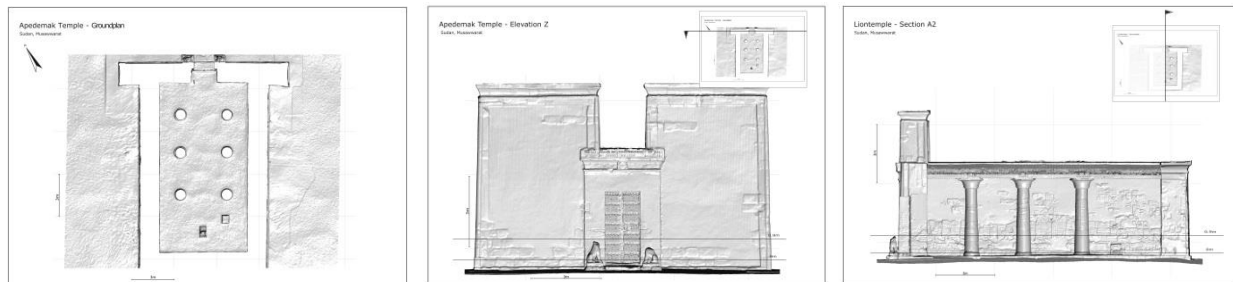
Example of plans (left), elevation (middle) and sections (right) of the Apedemak temple, Musawwarat es-Sufra, Sudan.
